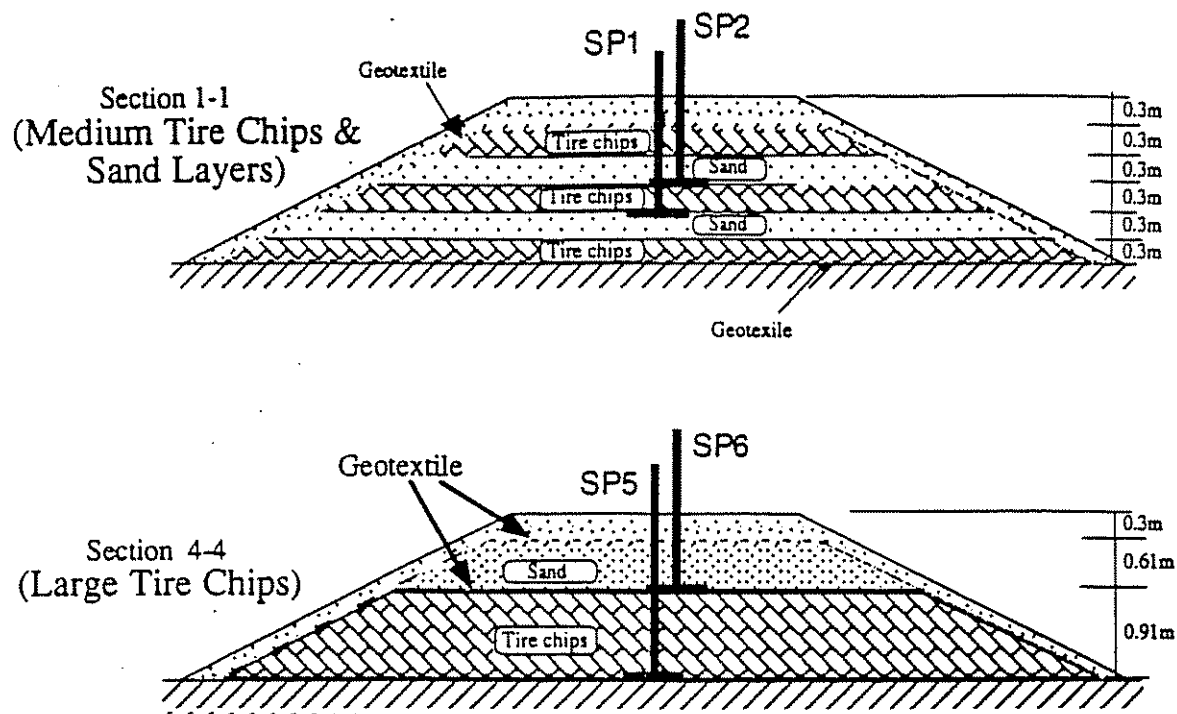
Elevation View of Two Test Embankment Sections as Designed
